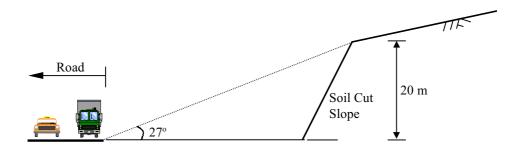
Cross-section of a Hypothetical Soil Cut Slope
